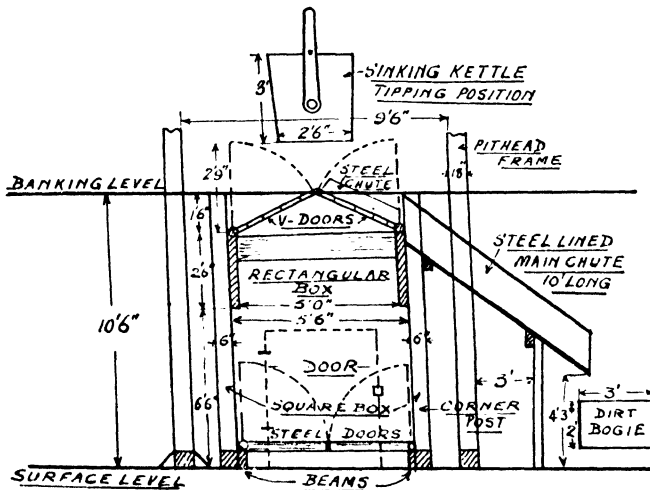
Sectional Arrangement of Surface Structure for Dealing with Sinking Debris.
